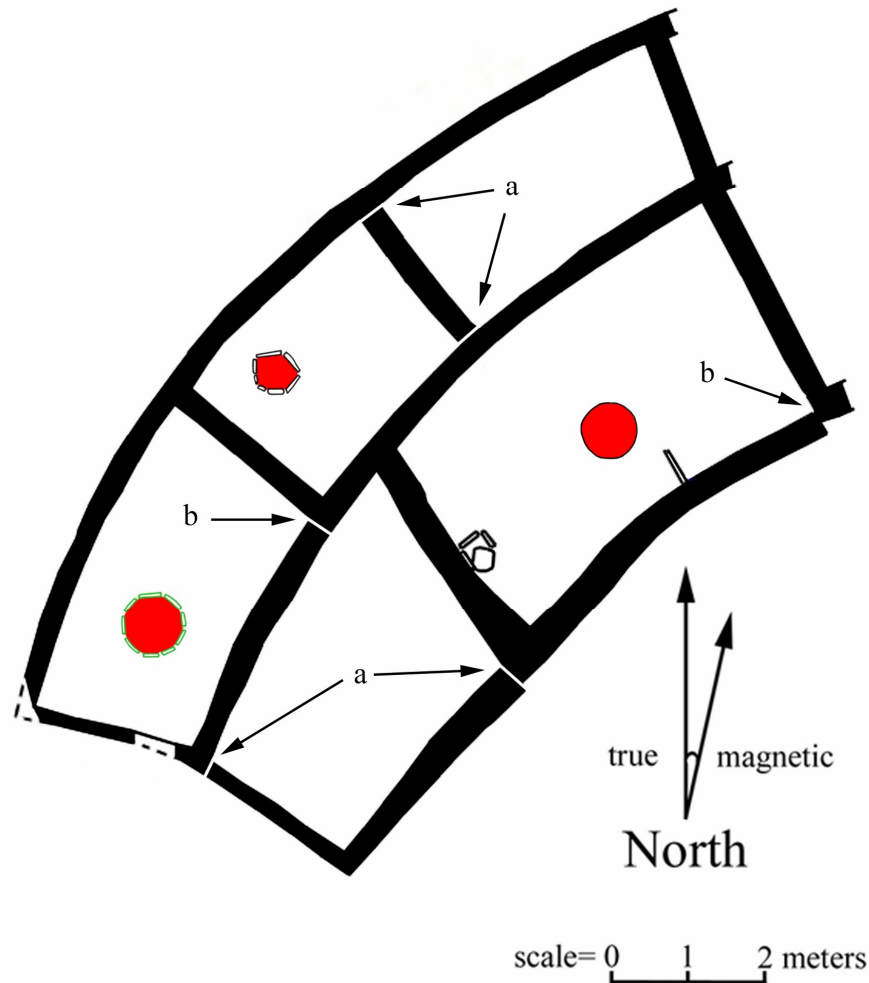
Early Pueblo II wall ties and abutments: a) abutment during a single construction event; b) added walls.
